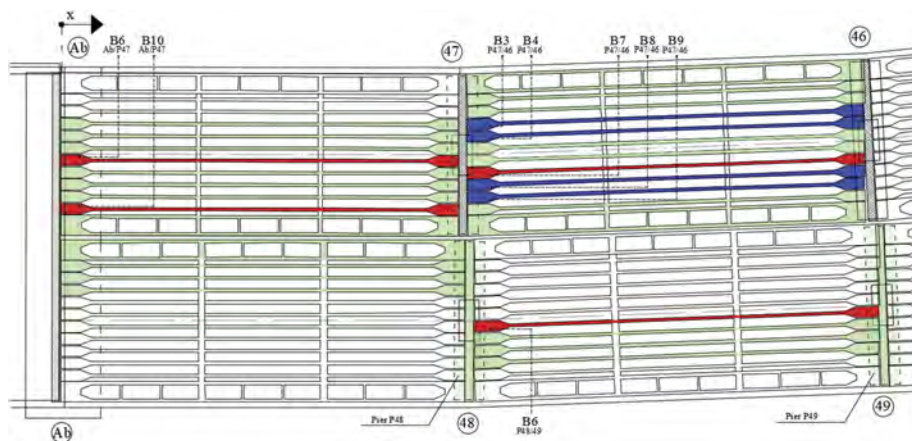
In-service layout of the investigated structural members (first group of tested girders in blue, second group of tested girders in red).
